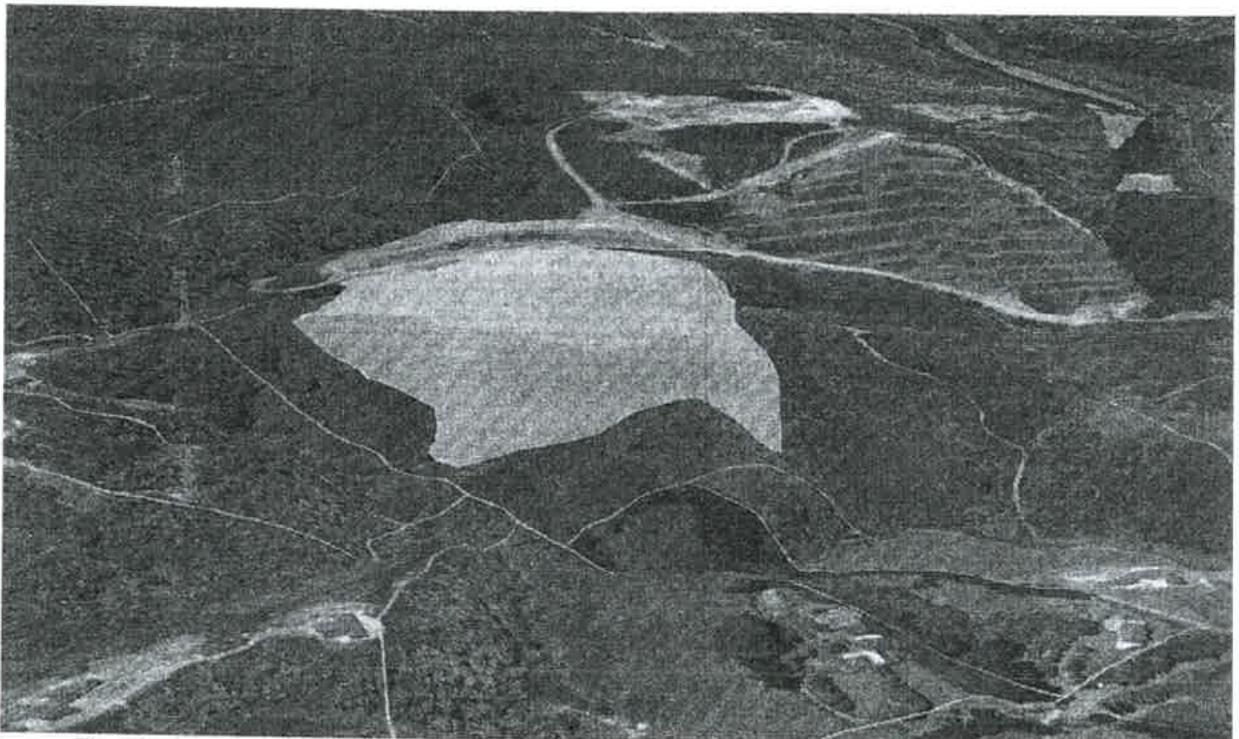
Aerial View of Stage 2 of Proposed OBDA (Looking East Towards Existing Quarry)
